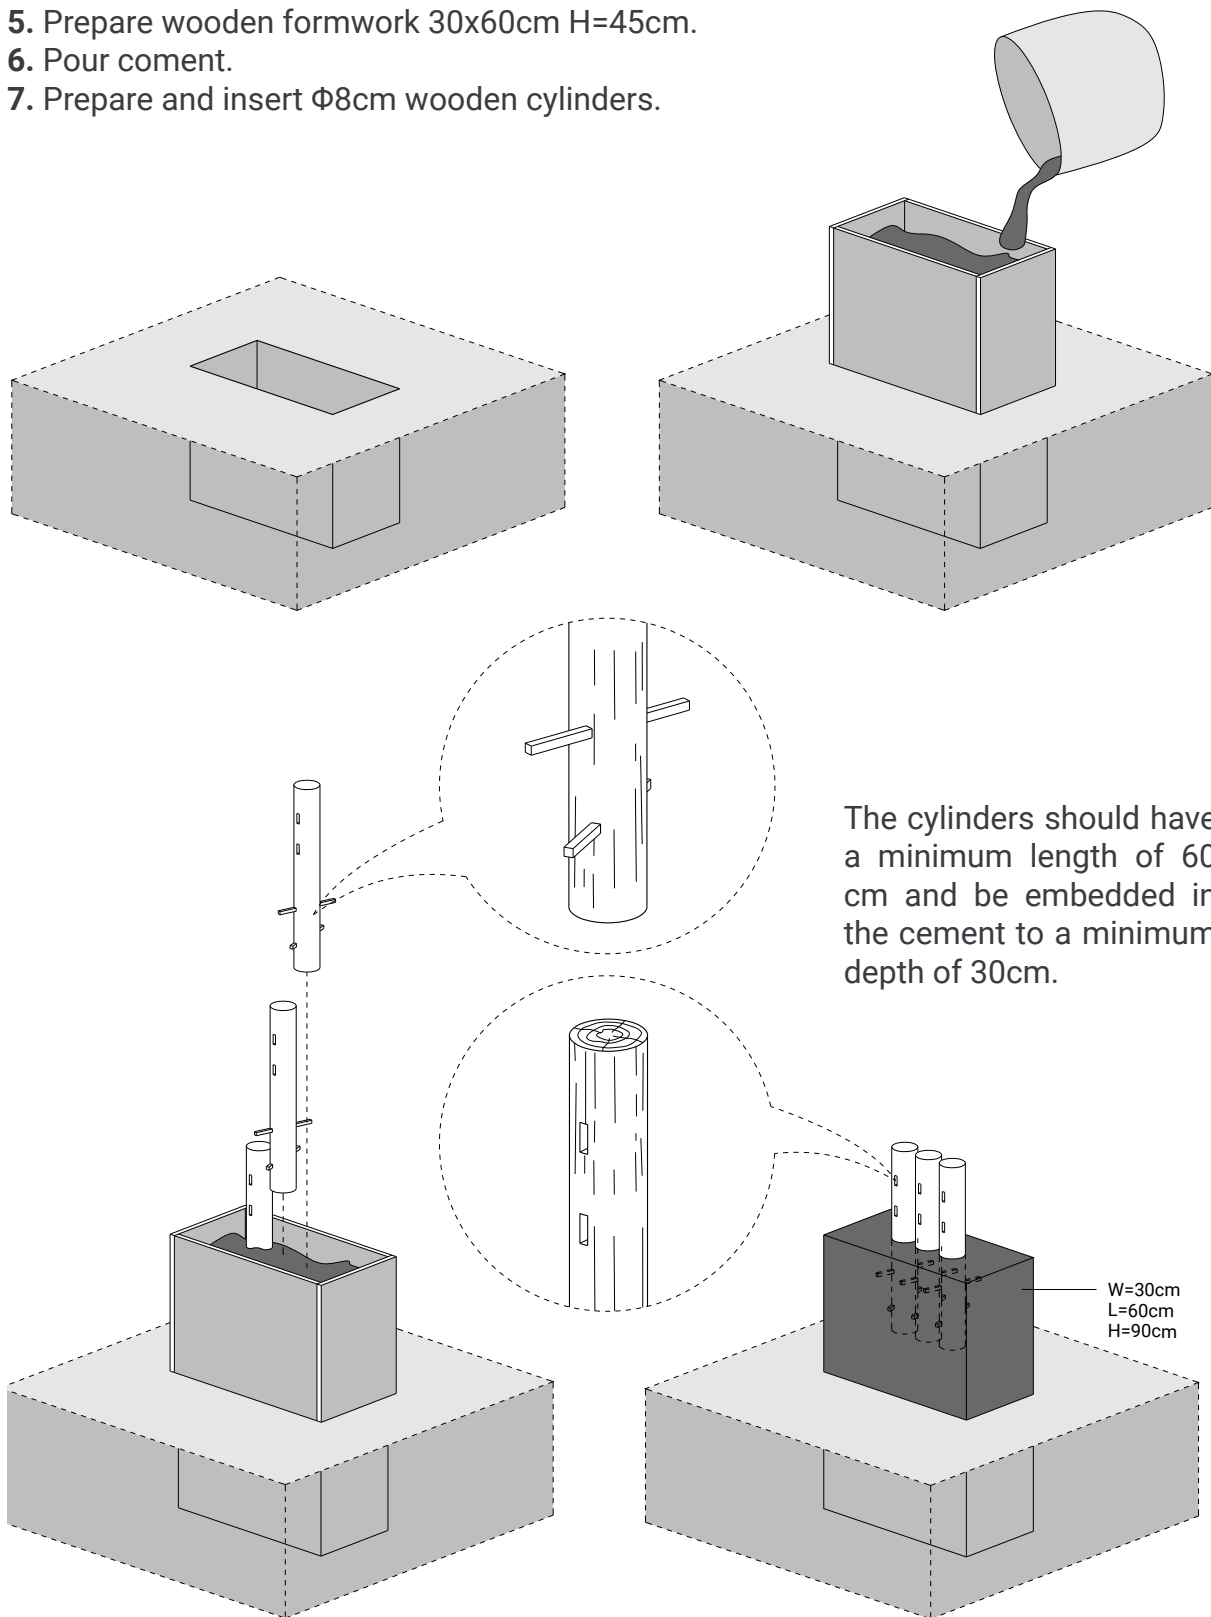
Det. A. Connection of the supporting structure (columns) with foundations (concrete block). Author's graphics.
